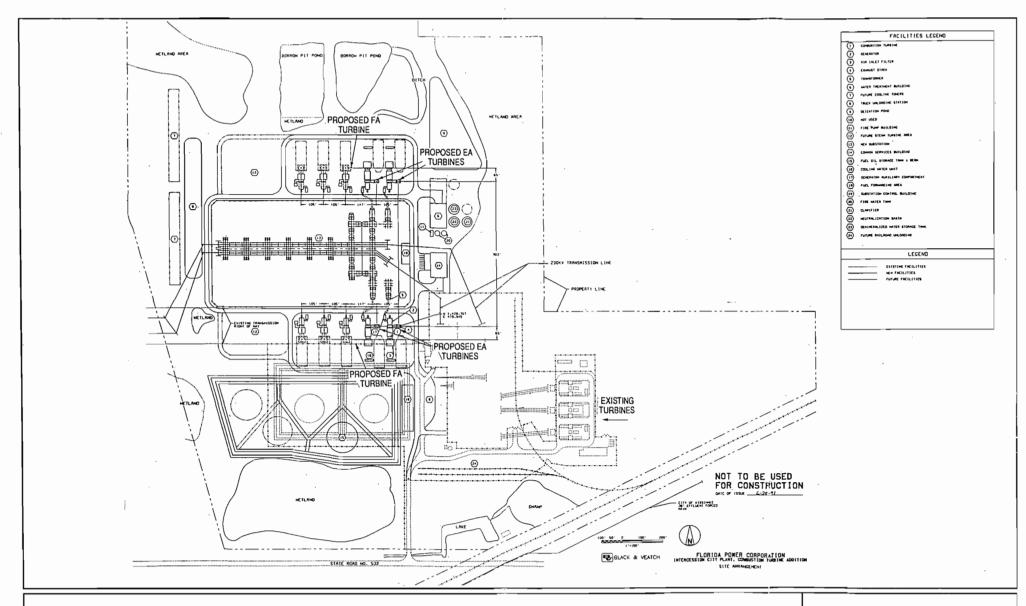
SITE PLAN OF THE EXISTING TURBINES AND PROPOSED TURBINES
